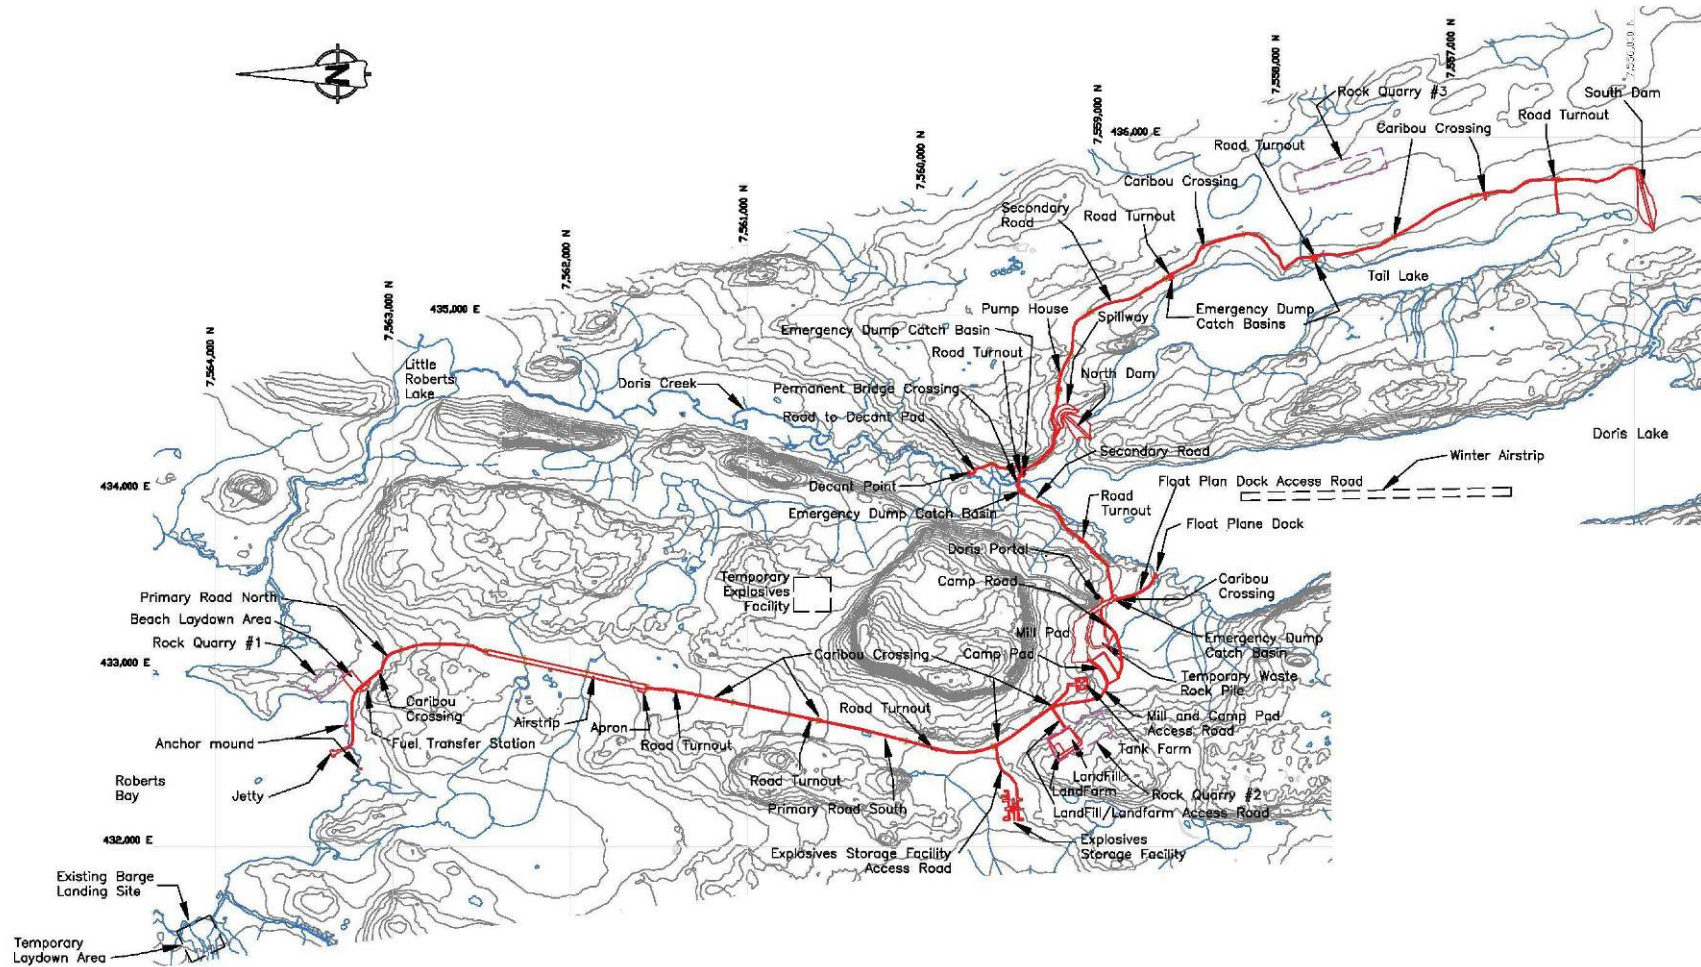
Overall Site Infrastructure Layout – Doris North Project
